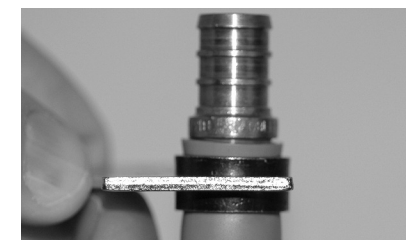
Hold Gauge Perpendicular To Tube and Slide Over Ring
